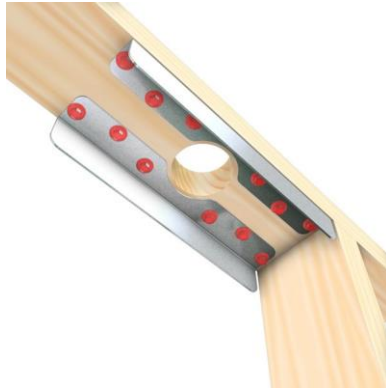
100mm minimum truss clearance to penetration with PFF2 reinforcement.
